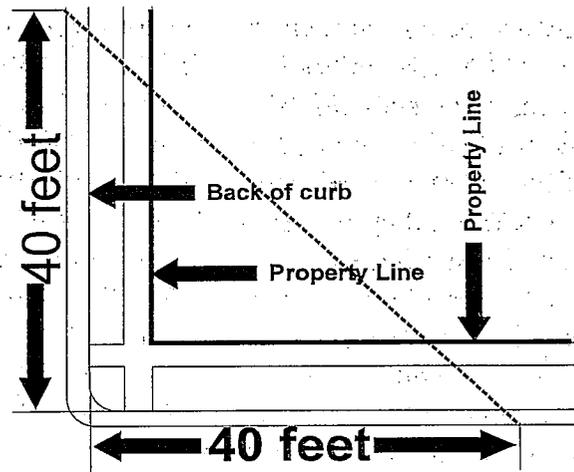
Clearview of intersecting roads, 40 foot clearview zone with sidewalk, curb and gutter.
